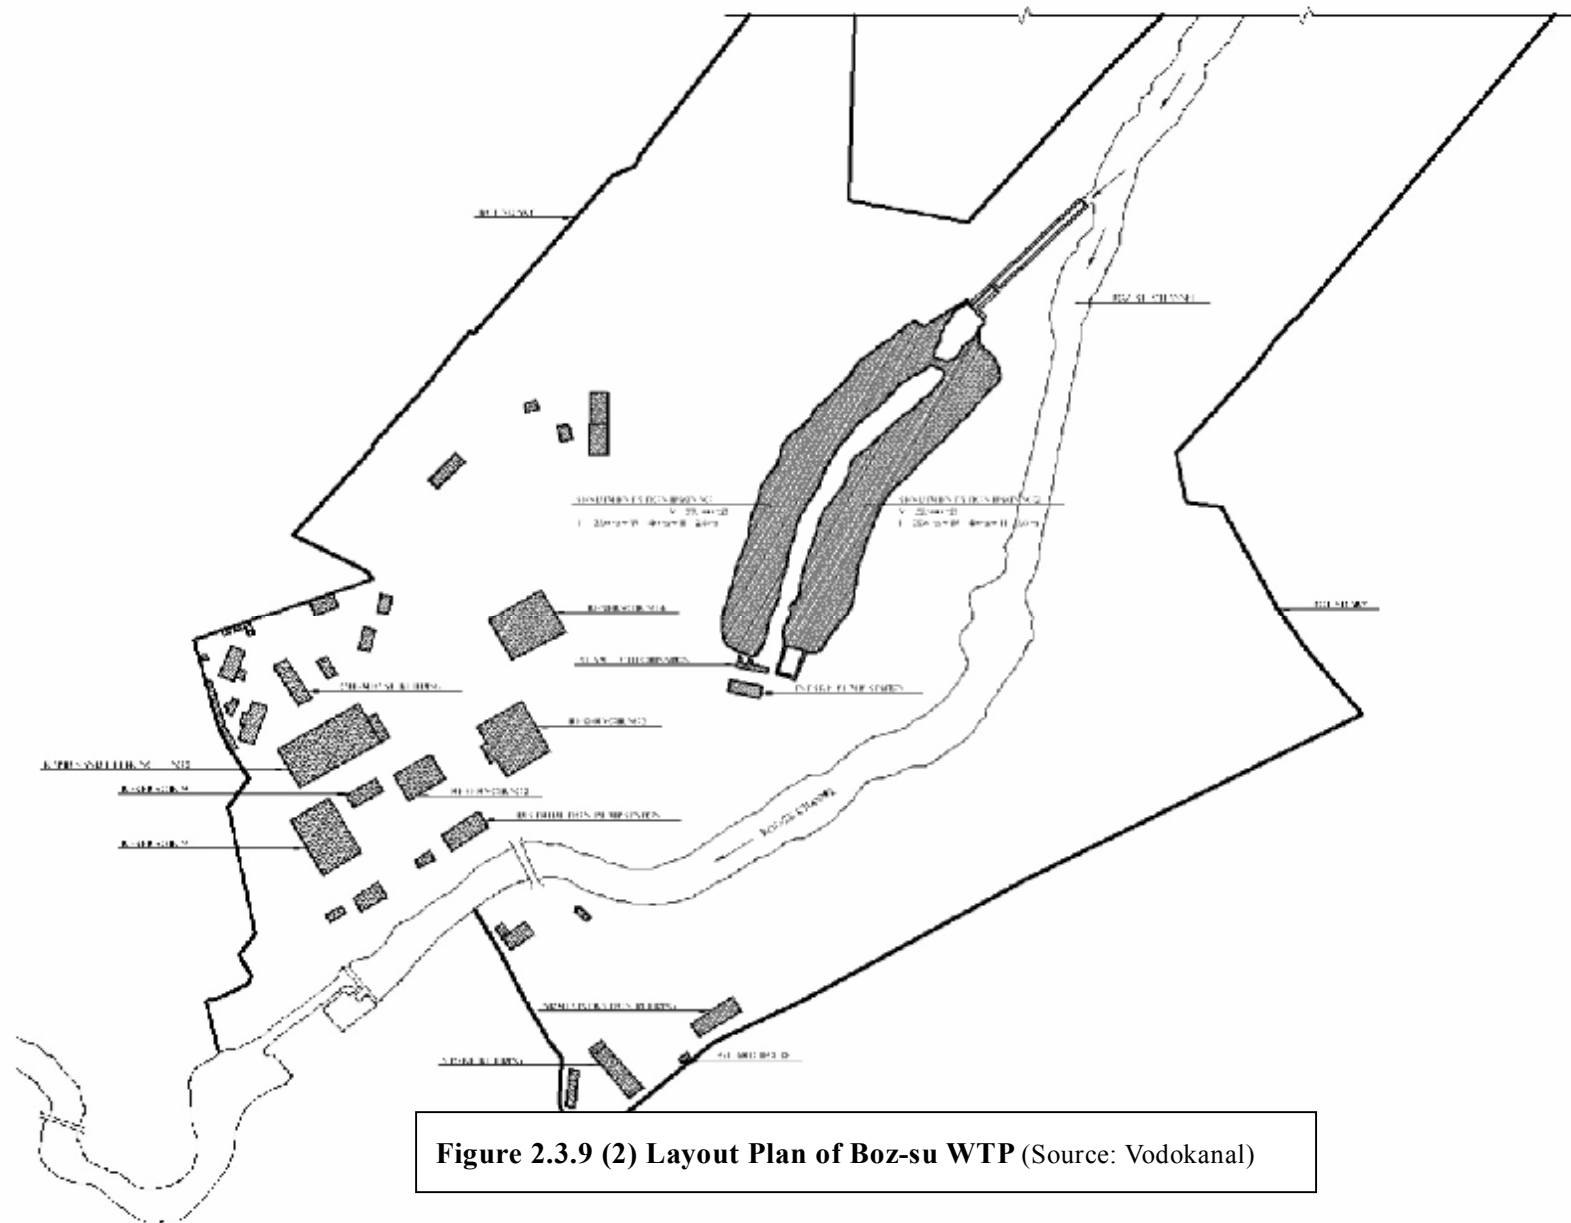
(2) Layout Plan of Boz-su WTP (Source: Vodokanal)
